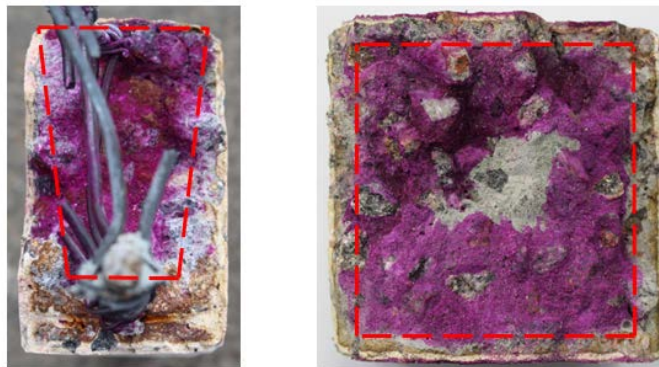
The nature of corrosion damages development in concrete of reinforced concrete beams (a) and unloaded auxiliary samples (b).
